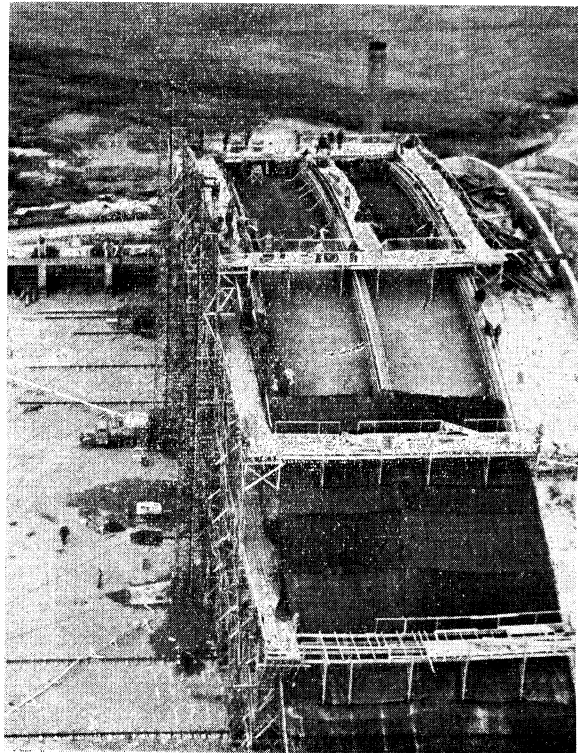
Cold weather concreting at U. S. Air Force base, Rapid City, S. D. Note the runway arrangement, protective housing, steam pipe leaders for heating, and track installation for centering
